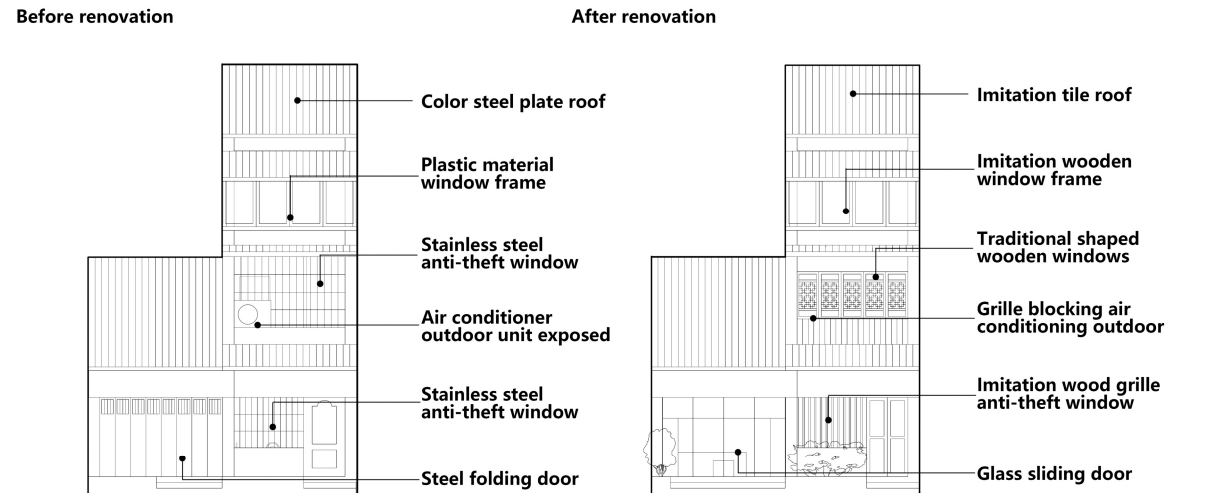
Street Node 2 Residential Building Pre - and Post Renovation Elevation
